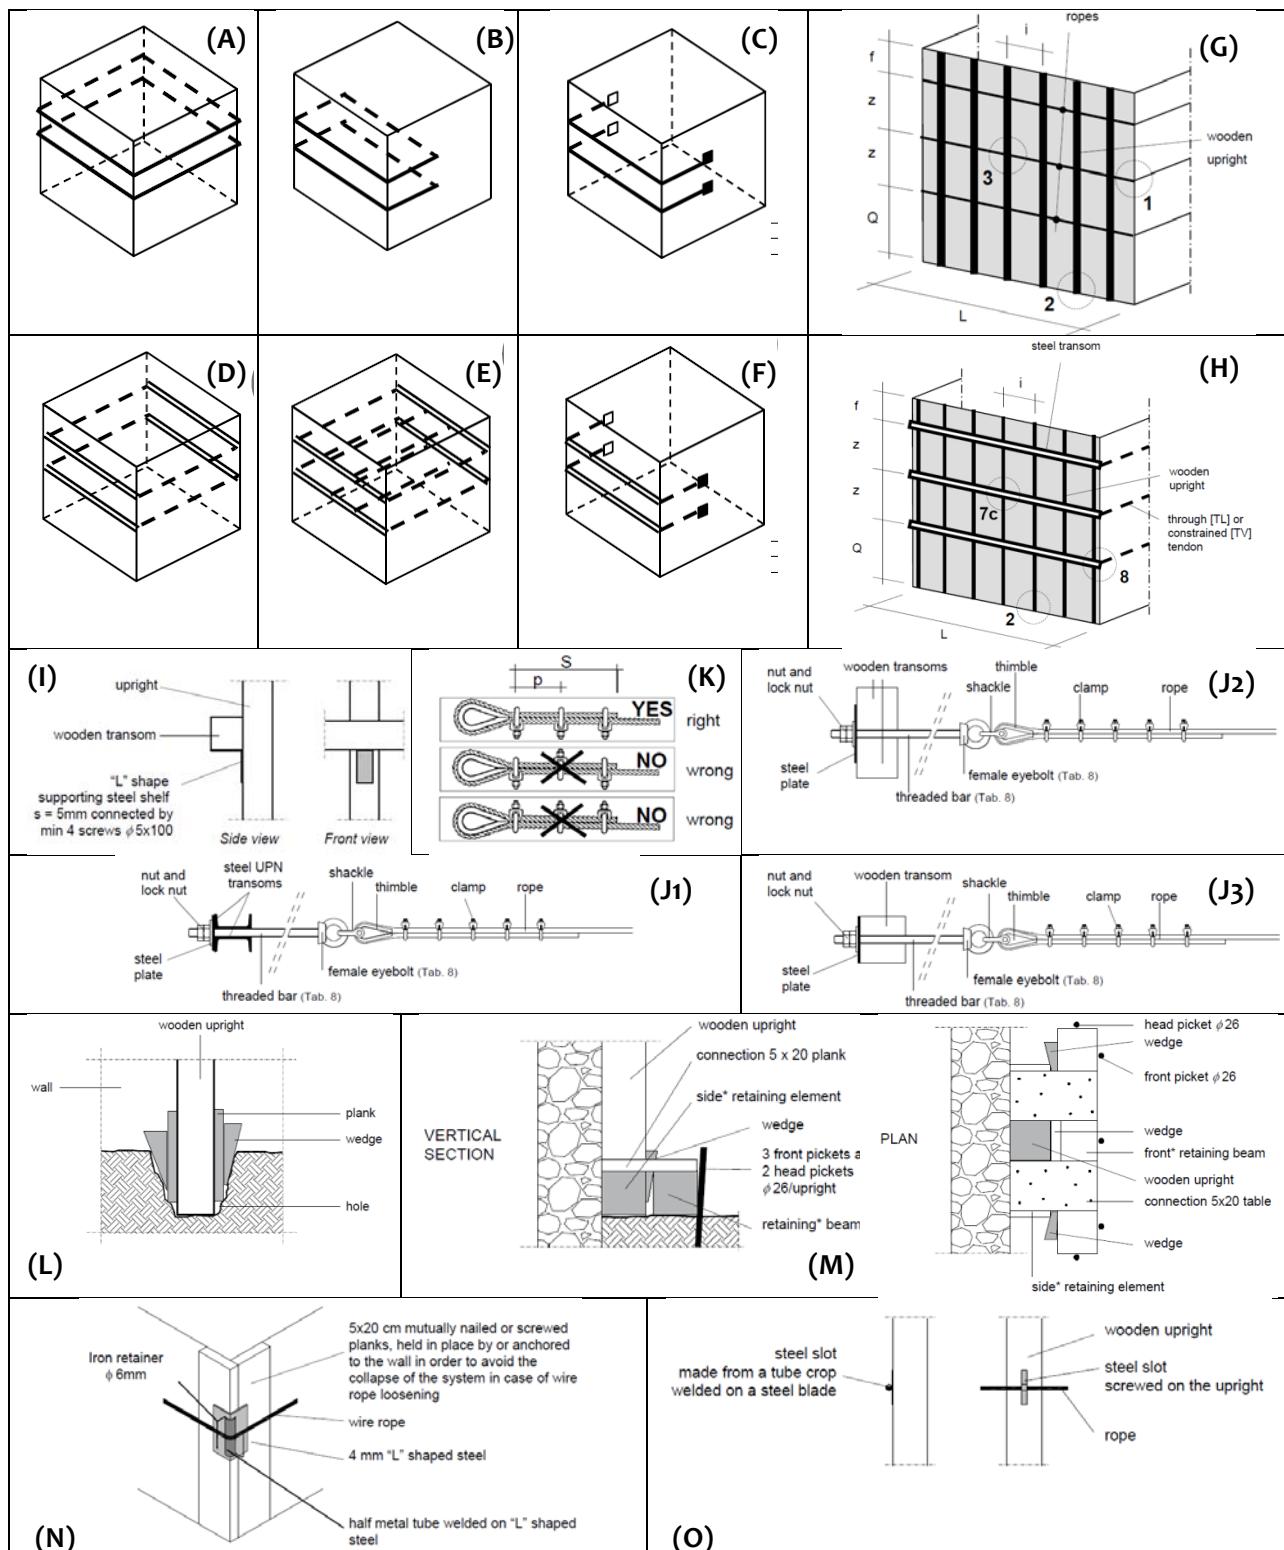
Possible configurations for tying: (A) Full external tendons; (B) Partial through tendons; (C) Anchored through tendons; (D) Beam with external side tendons; (E) Beam with through internal distributed tendons; (F) Beam with anchored side tendons; (G) Tendons with wooden uprights; (H) Steel beam with wooden uprights; (I) Wooden beam to upright connection; (J1-J3) Beam to tendon connections; (K) Clamp tightening; (L)-(M) Upright base details; (N) Corner detail; (O) Tendon-upright crossing (Grimaz et al., 2010)
